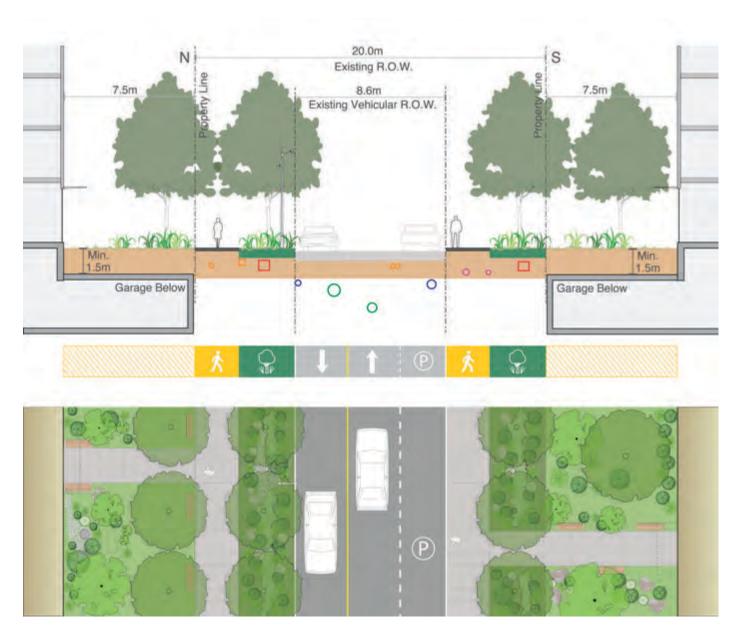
Section and Plan of Erskine Greenway - Recommended Final Condition
